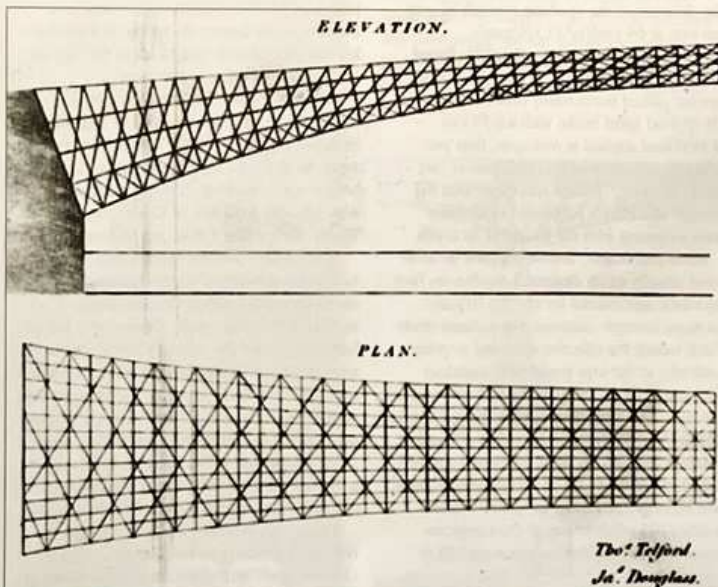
Telford's 183 m span iron arch proposal of 1801 for the new London Bridge had widespread support but was never built
